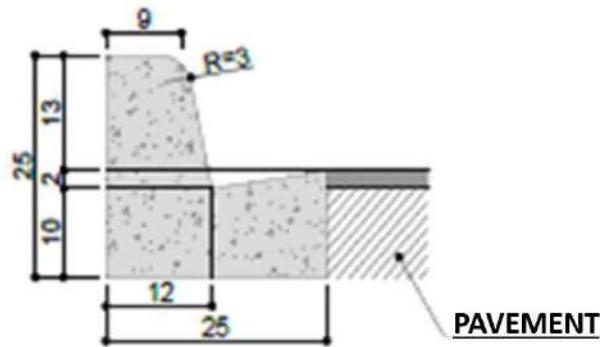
Illustration of Concrete curb, CC-03 (Source: QG Konstruktion GmbH).
